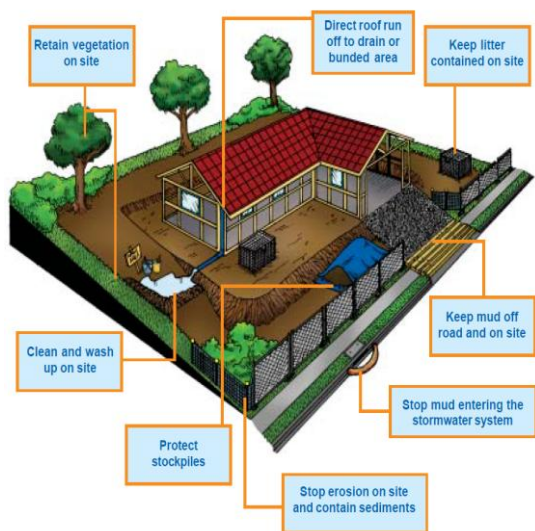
Schematic overview of the on-site stormwater management practices during construction
